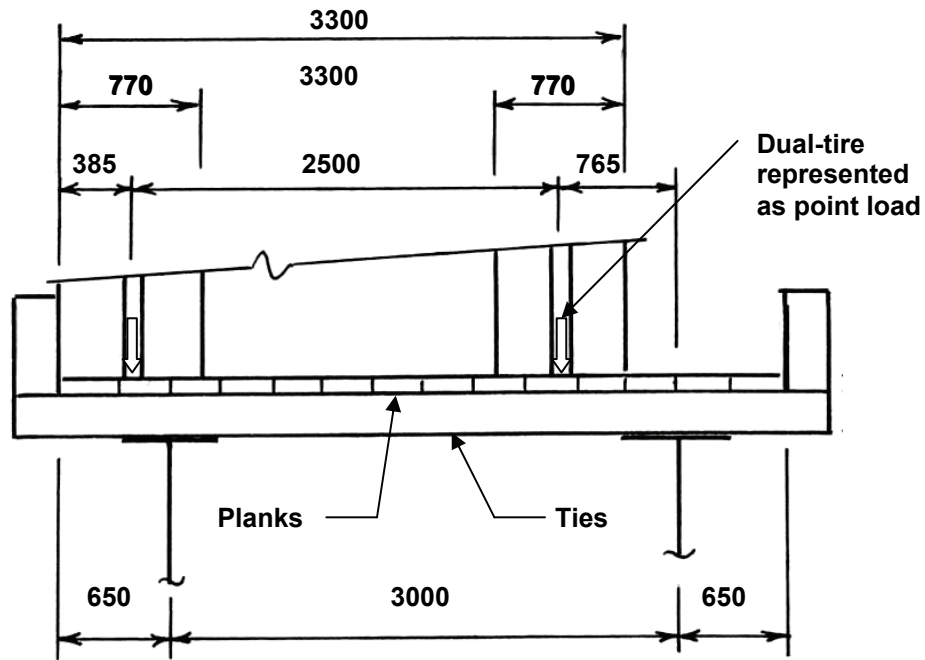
Transverse position of Heavy Off-highway Design Truck on timber deck on girders at a spacing of 3.0 m
